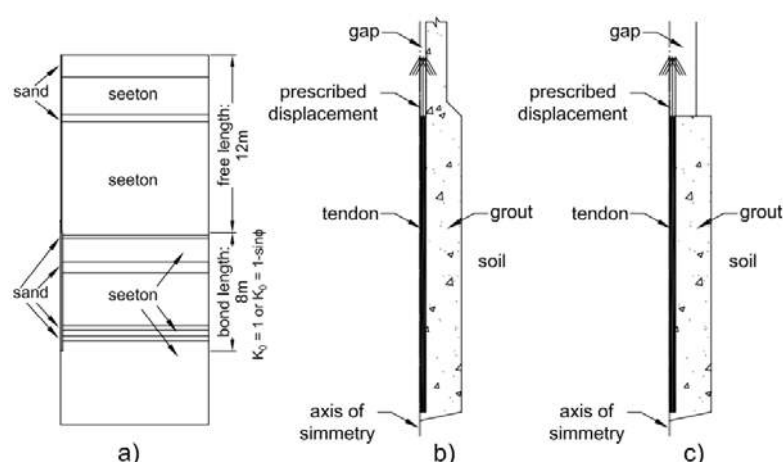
Model geometry: a) Full geometry; b) anchor detail (S1 and S3) and c) anchor detail (S2)
